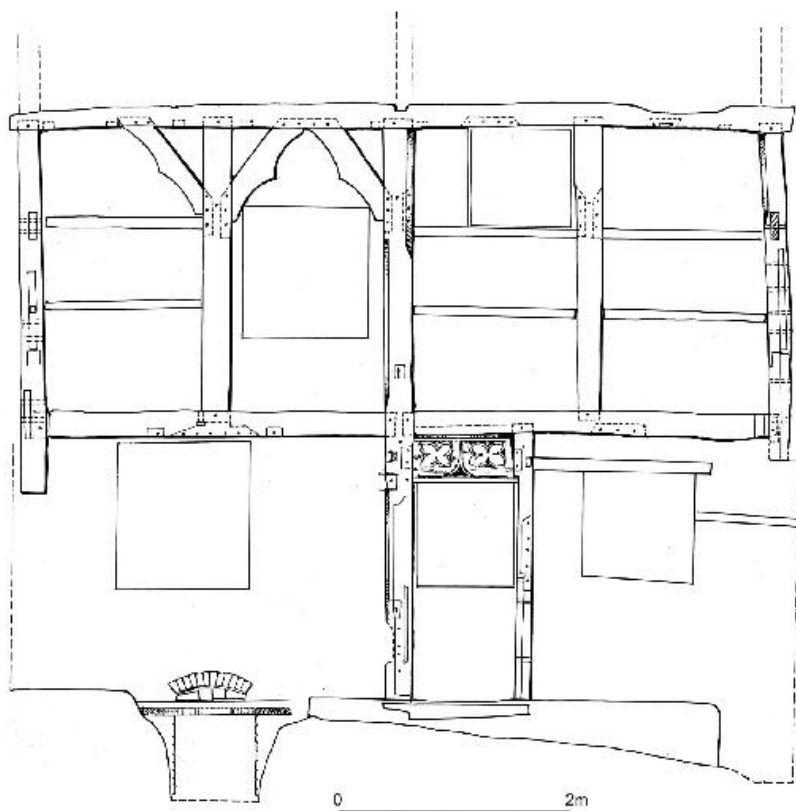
No. 41a Bridge Street: the south elevation, as recorded before restoration
